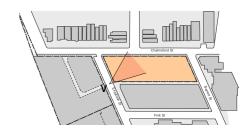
ACTIVATED GROUND PLANE CORNER OF CHELMSFORD & BARRETT STREET
